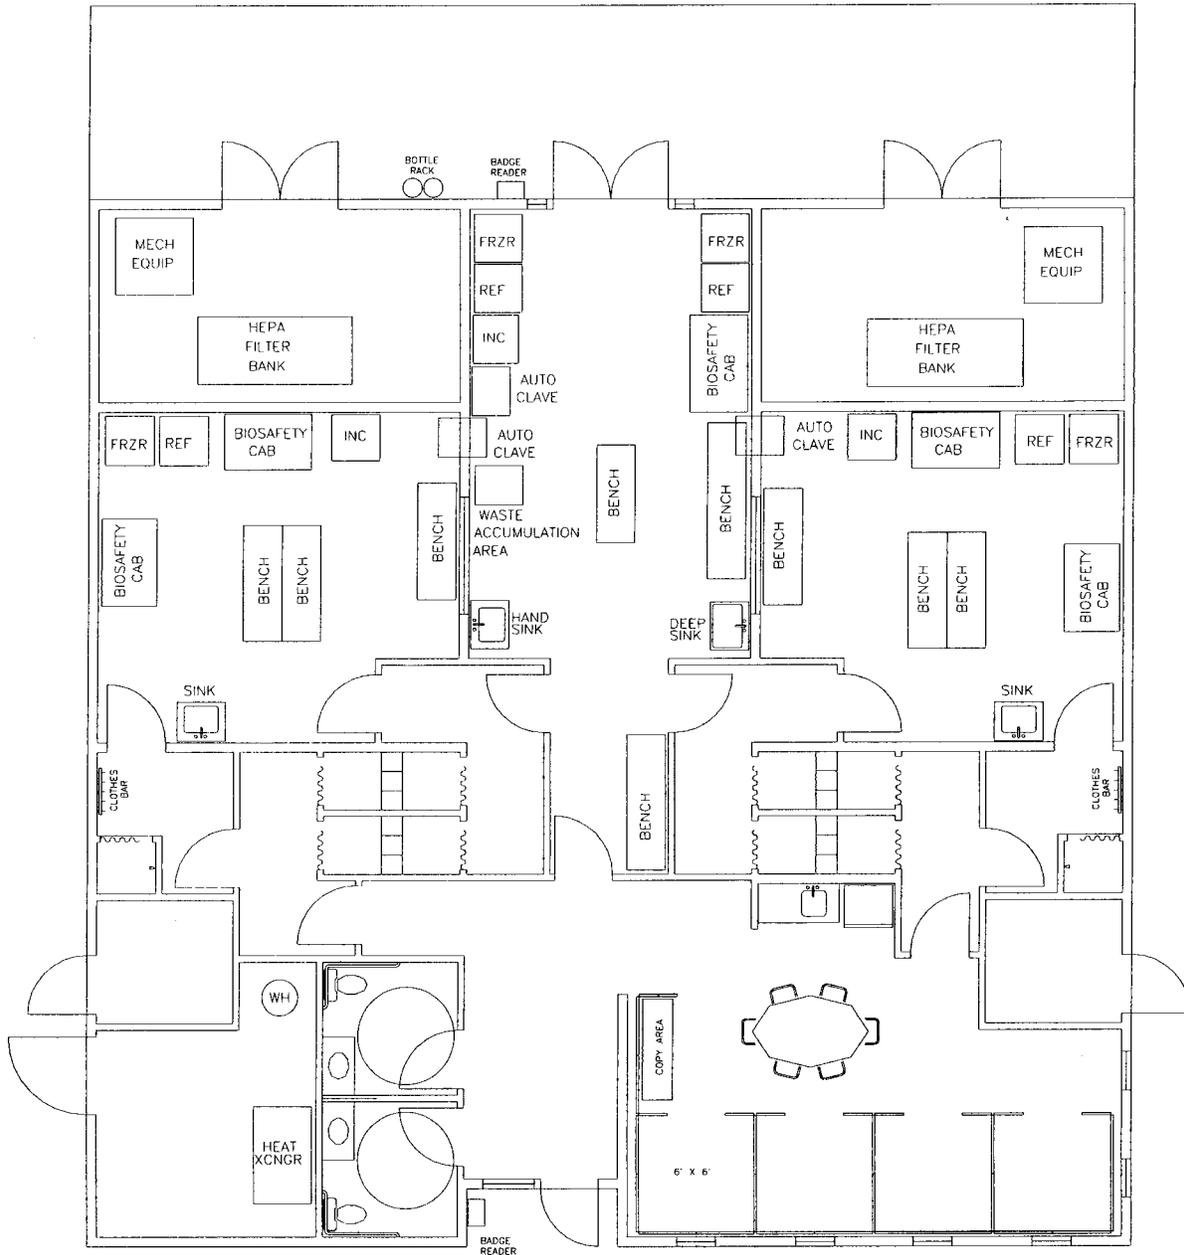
Conceptual floor plan showing equipment layout for the proposed BSL-3 facility at LANL
